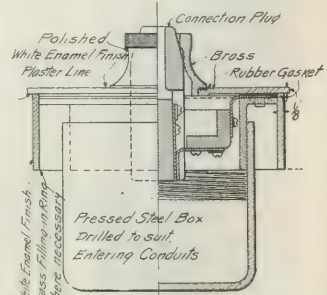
DETAIL OF PLUG WALL RECEPTACLE FOR LOCAL LIGHTING OF FURNITURE, DESKS, ETC.
